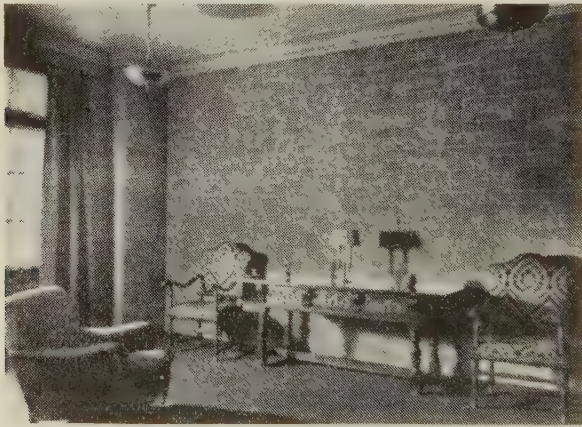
INTERIOR WALLS OF CONCRETE ASHLAR PAINTED
